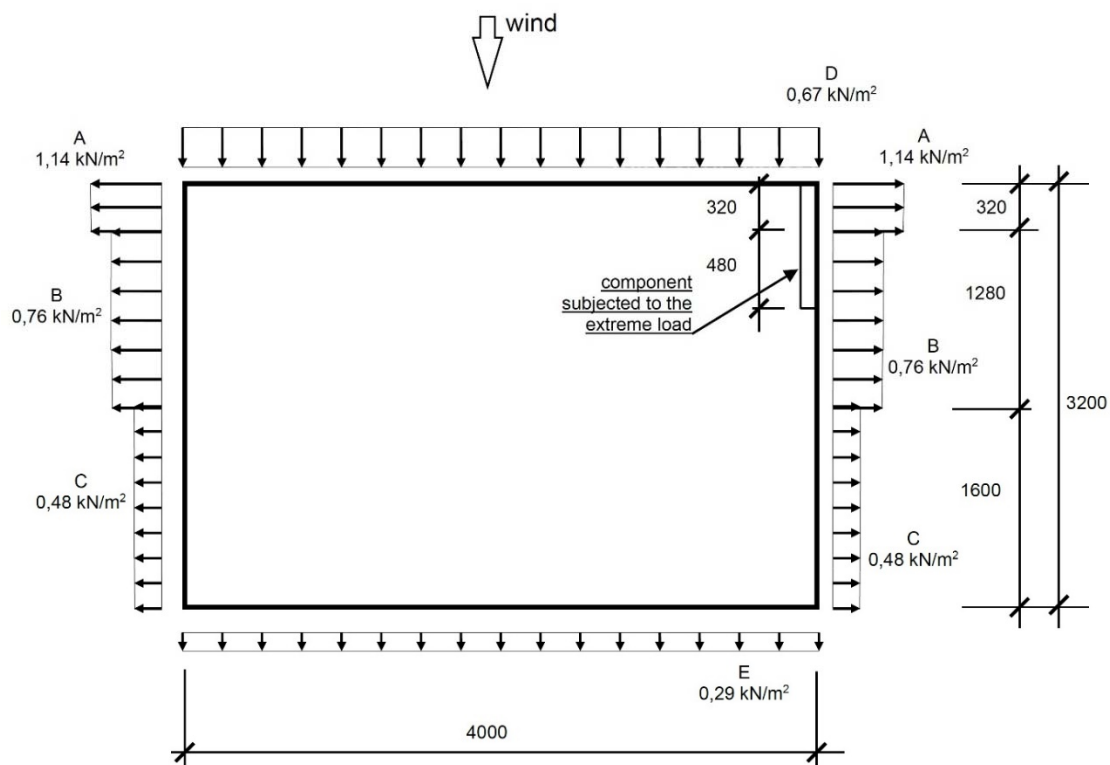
Wind load of a typical building constructed from the tested wall components. Plan view, dimensions in [cm]. Characteristic values of wind pressure and suction were given.
